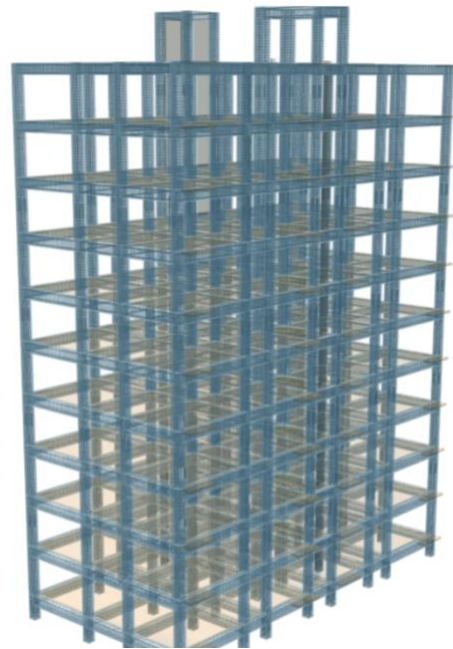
Structure with Masonry wall lift core: Rebar Diagram
